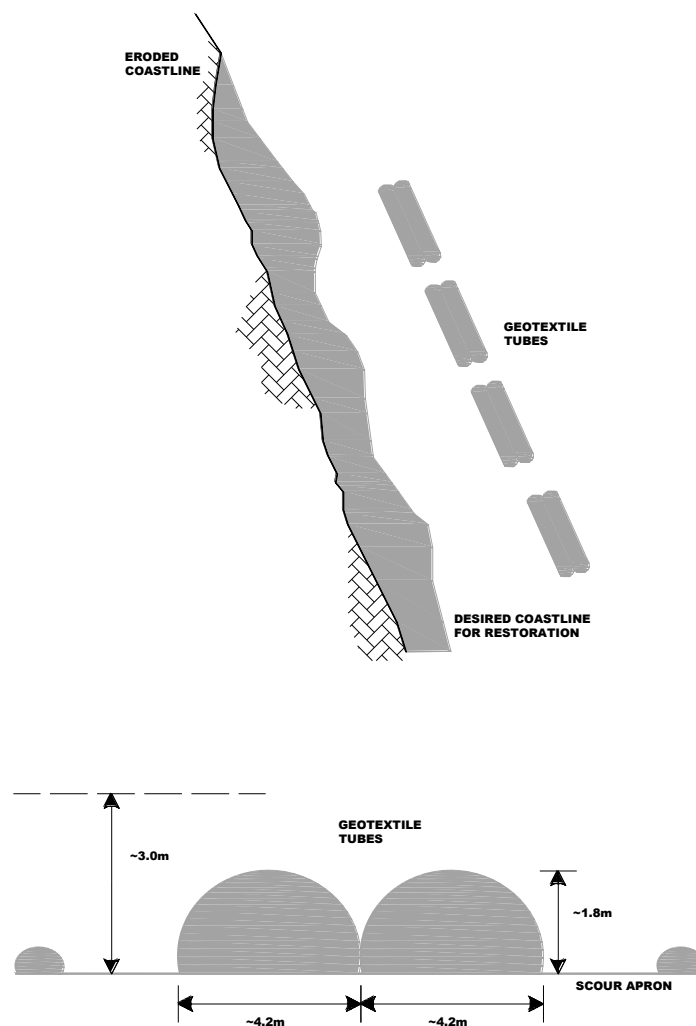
Layout and cross-section of the protection at Young-Jin beach
